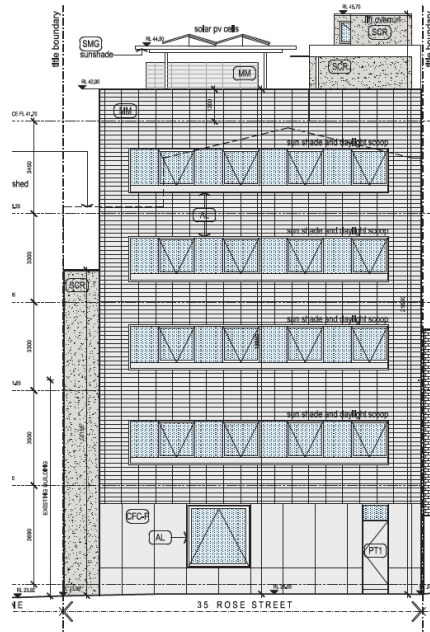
North (opposite the Garryowen Park) elevation (Section 57(a) plans)
